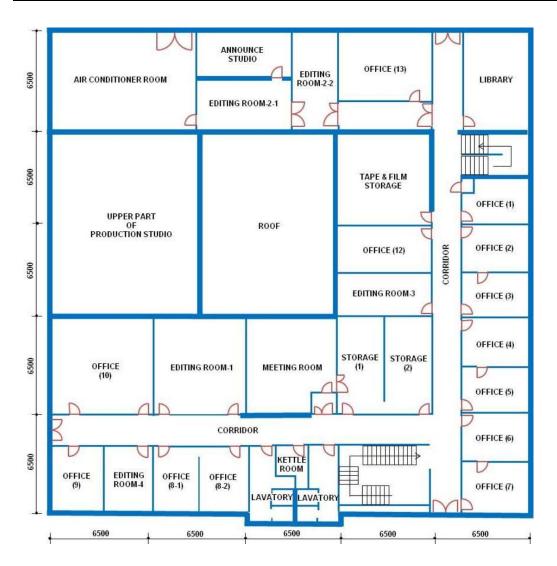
Kabul TV Station Floor Plan of Second Floor
